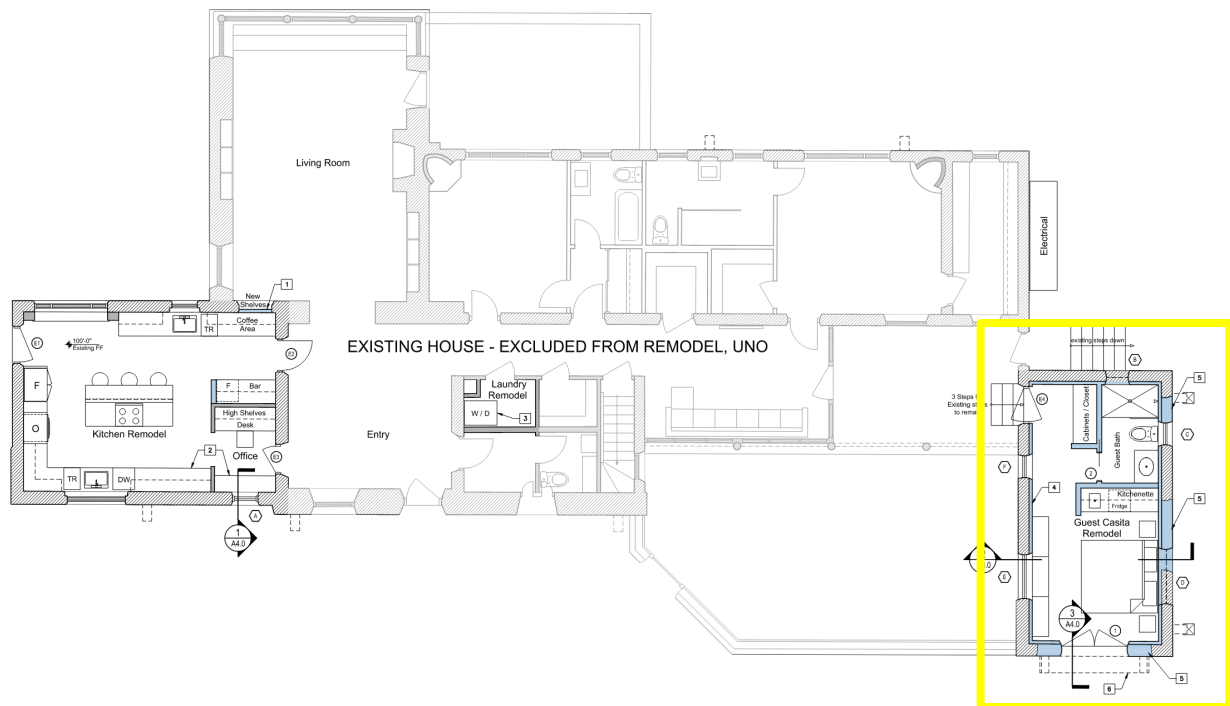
Proposed floor plan of the ADU change of use outlined in yellow.
